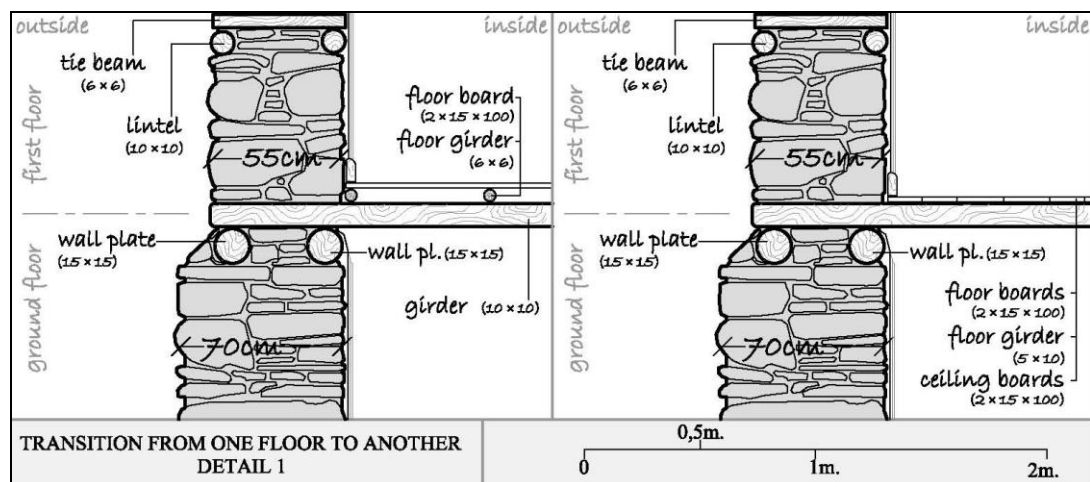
, Detail of wall where thickness decreases in upper section by exterior chamfer at the external surface, in case masonry wall continues in both floor; use of girder and floor girders together at floor change (left), use of only floor girders at floor change (right)
